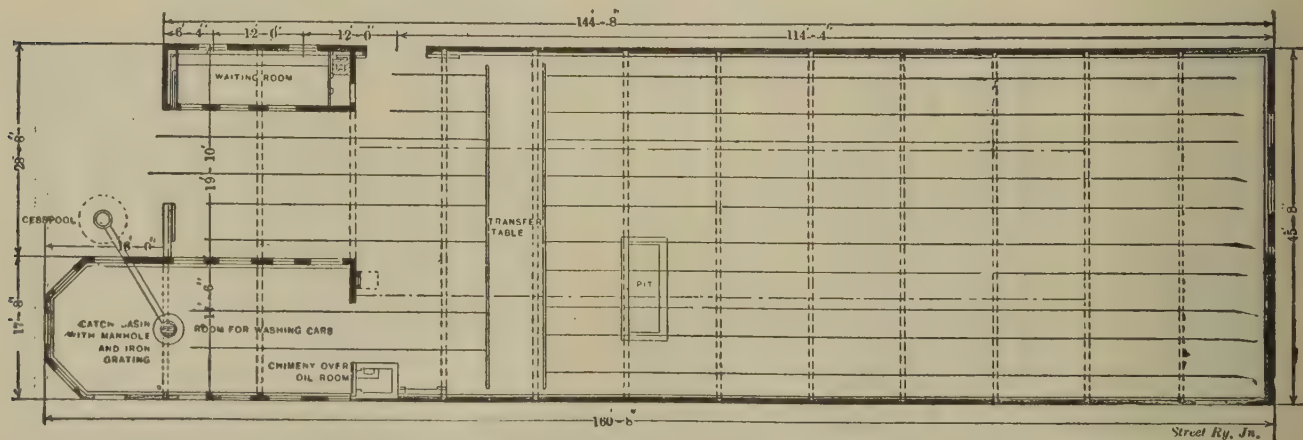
CAR BARN—FLOOR PLAN—UNION RAILROAD CO., PROVIDENCE, R. I.
